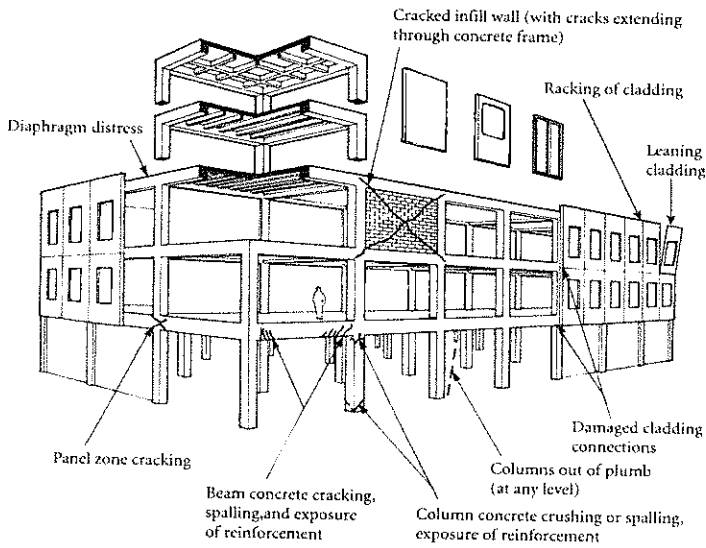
Inspection points for reinforced concrete frame buildings.
